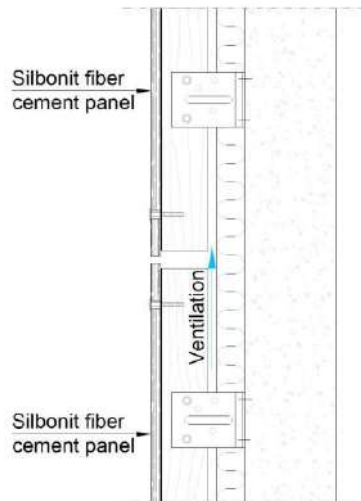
Example of a vertical section of the ventilated facade package along a horizontal joint between panels. Wooden subframe and Silbonit fiber-cement flat-panel cladding.
